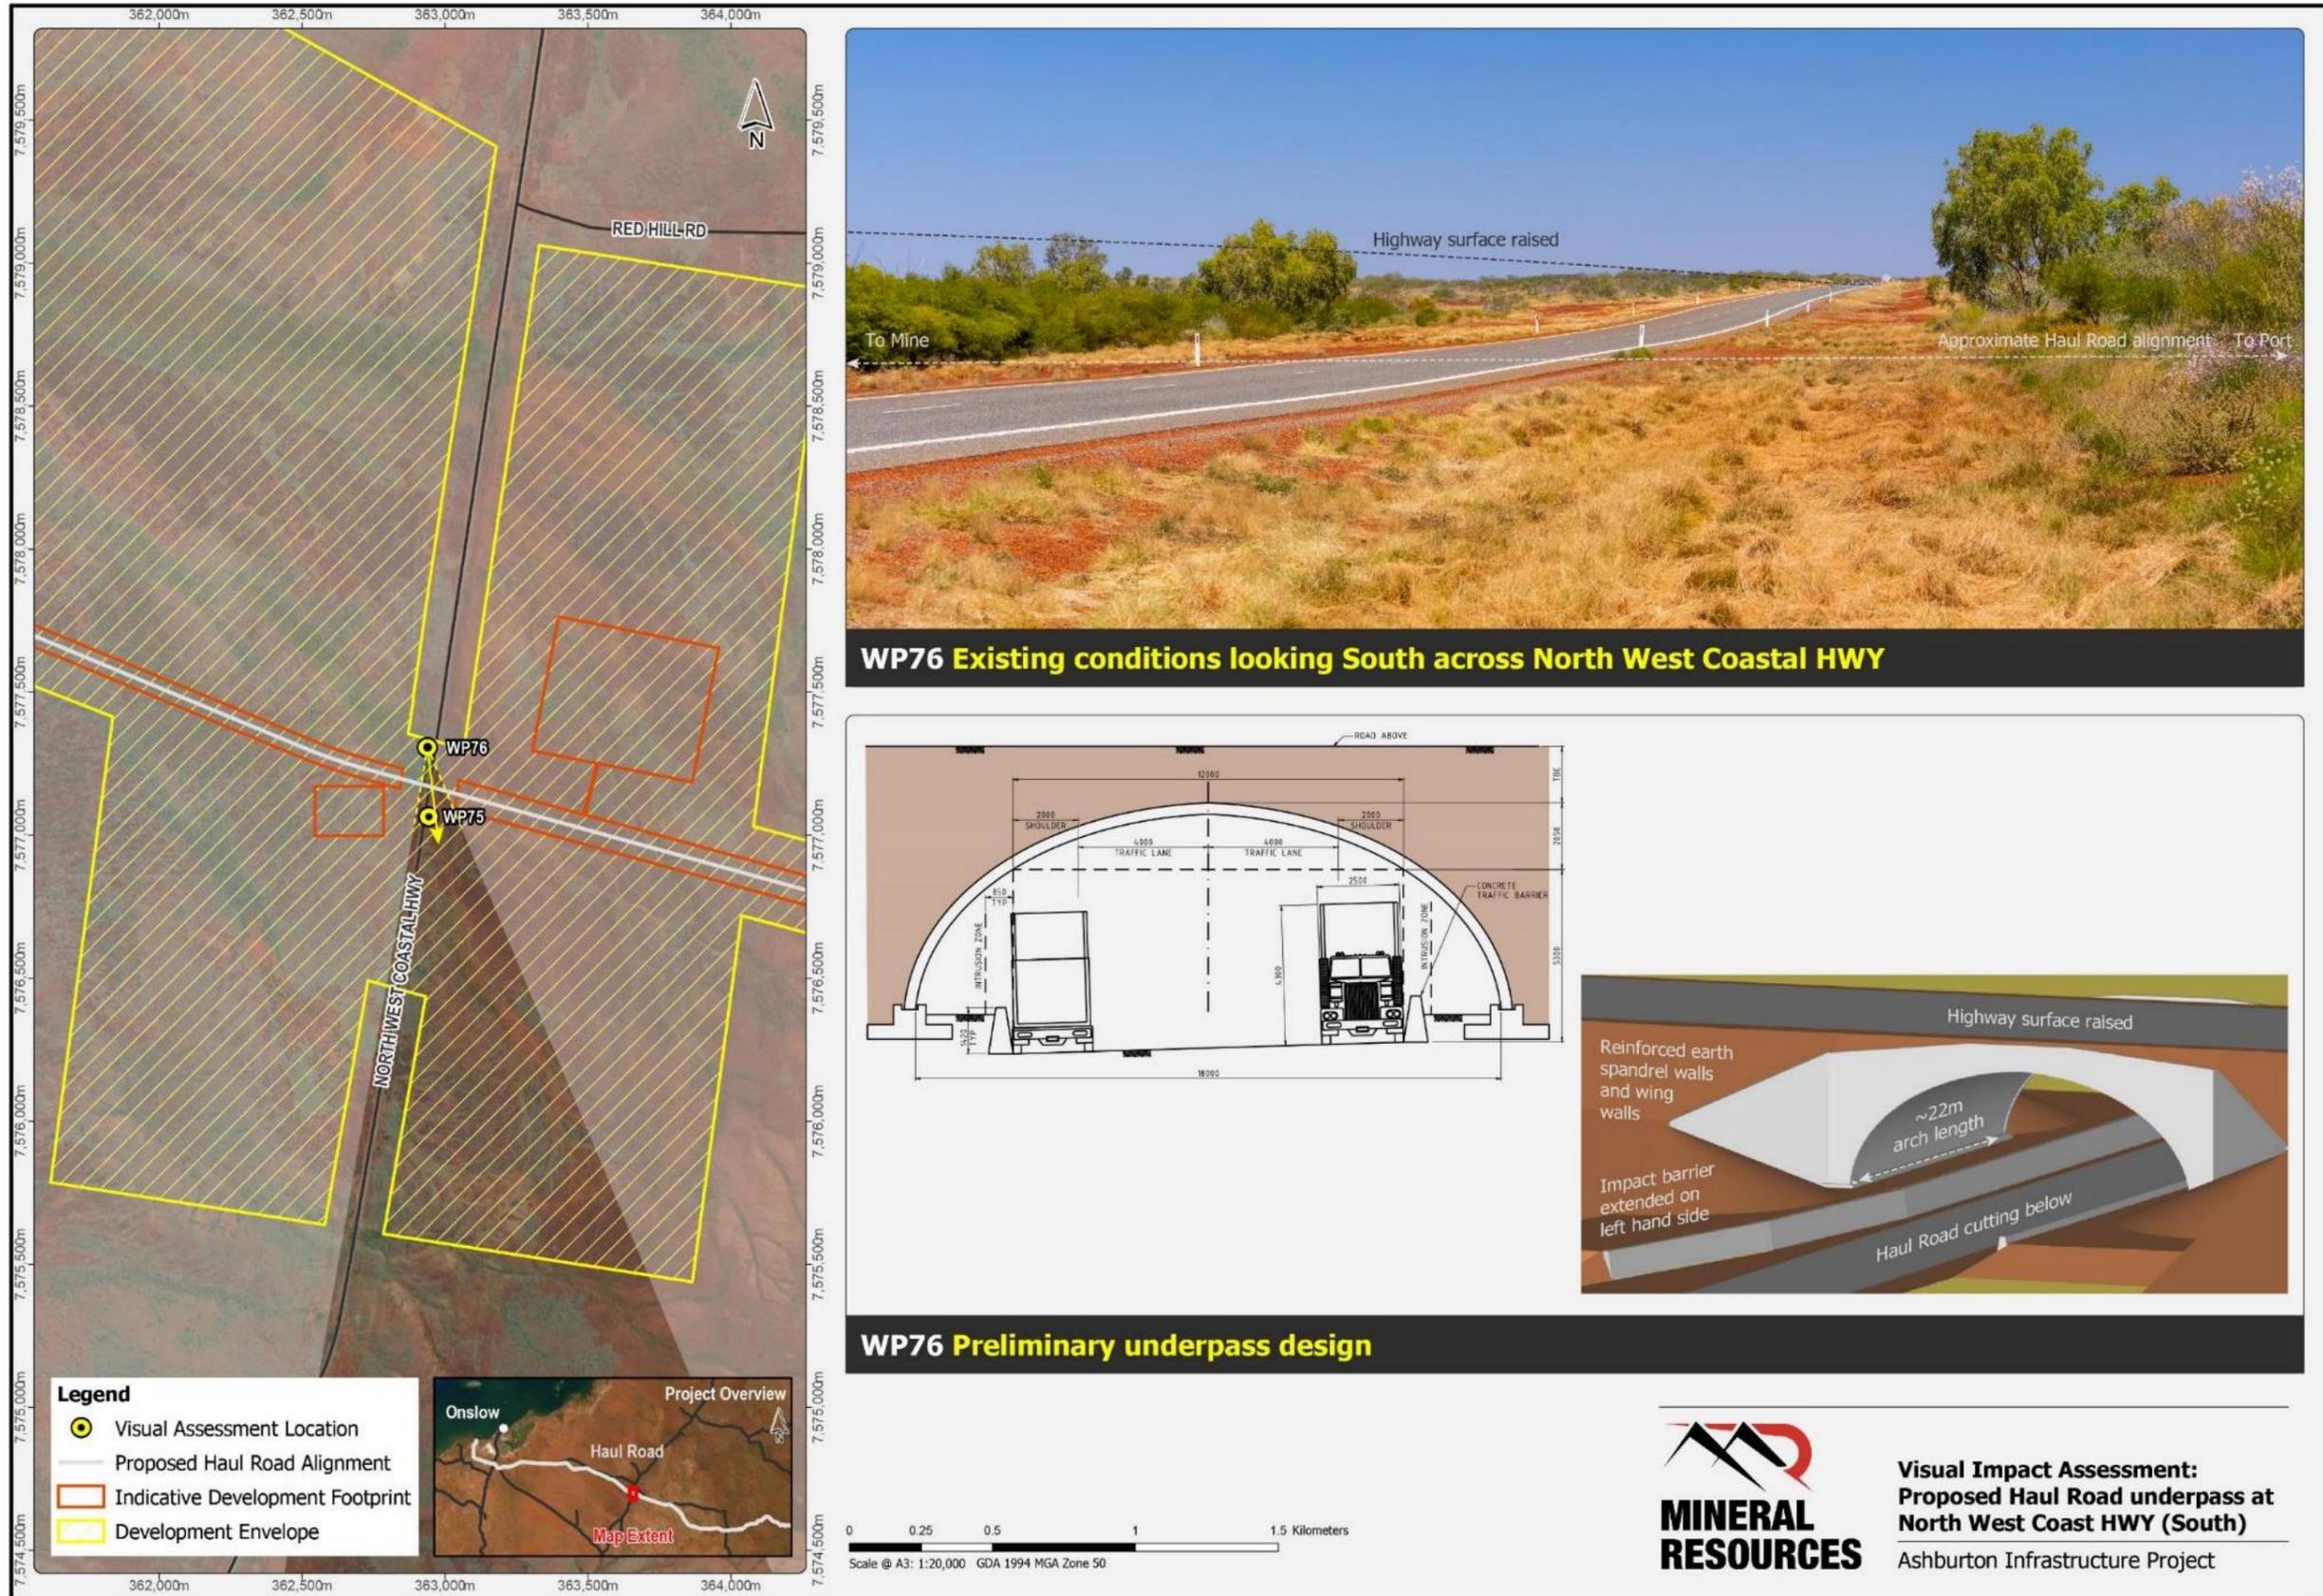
Visual Impact Assessment – Proposed Haul Road underpass at NWCH (South)
